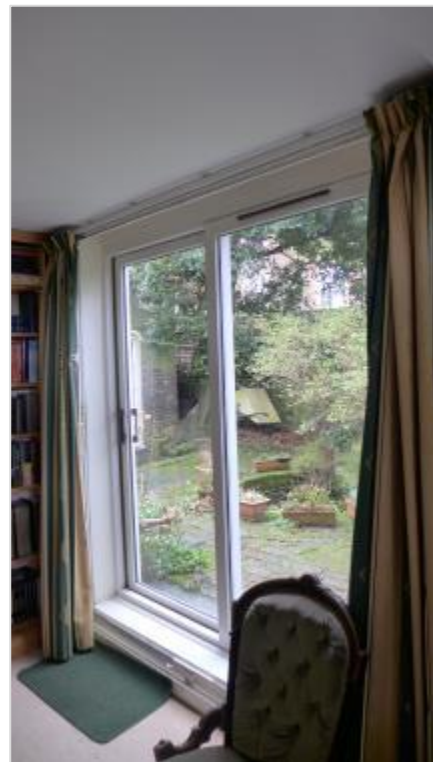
and 3.25: 1953 and Existing photos of rear elevation of study
